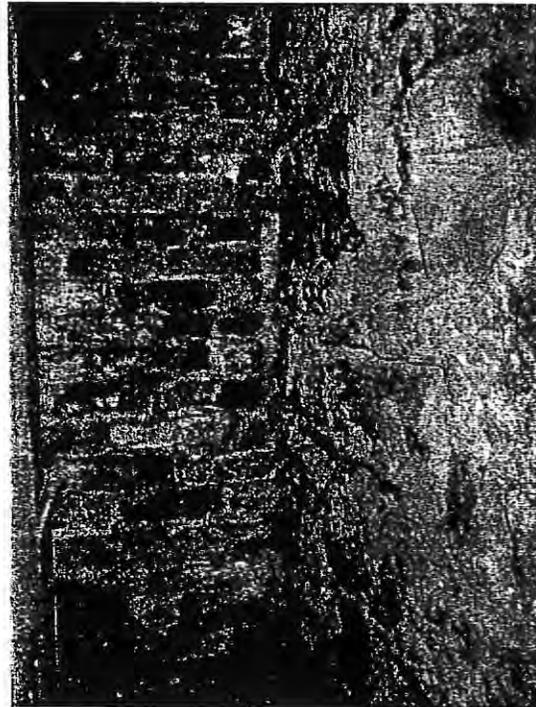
NW corner of cellar, showing mid-18th century brick foundation and c. 1825 cellar wall of adjoining building.
